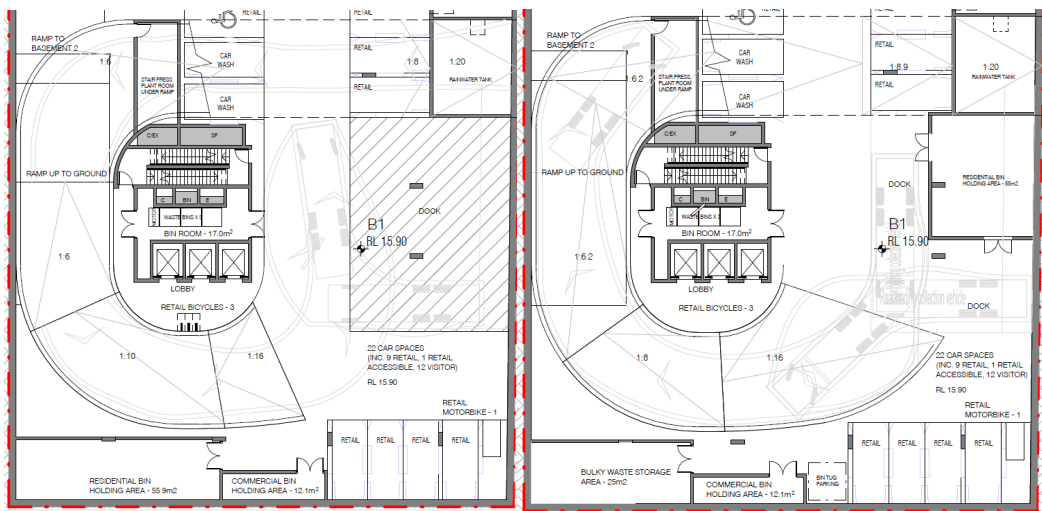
Original (Left) and Amended (Right) Loading Area – Building B1
